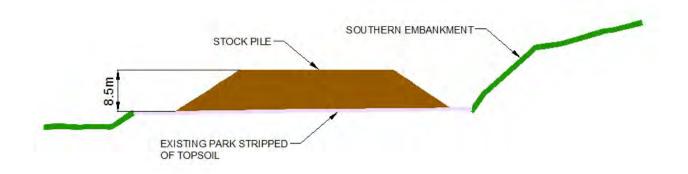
Cross Section – Stock Pile Excavated Material, Upper Park (north/south)
